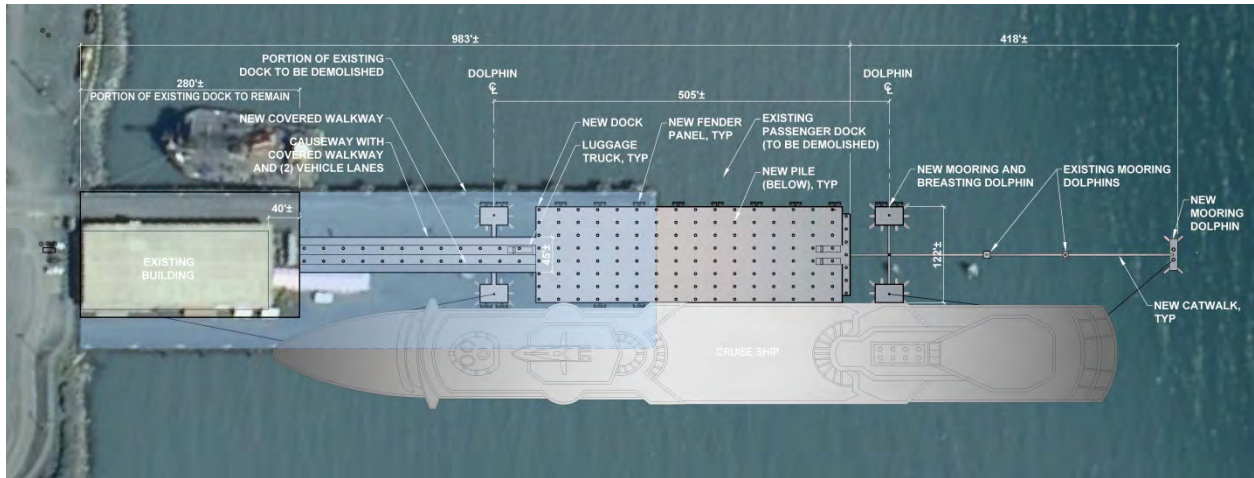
Option 4 – Minimal Pile Supported Dock Retaining Existing Terminal Building and Existing Foundation Piles Reinforced
